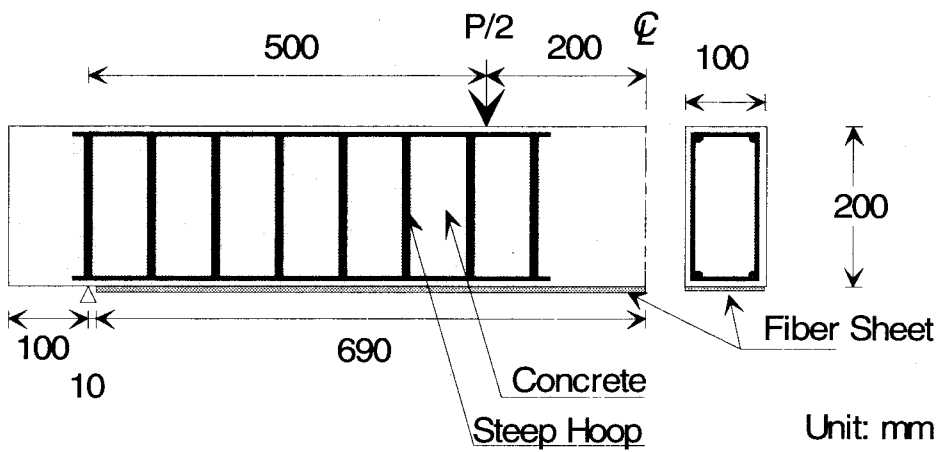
Specimen for Fiber Sheets (Transfer Test)
